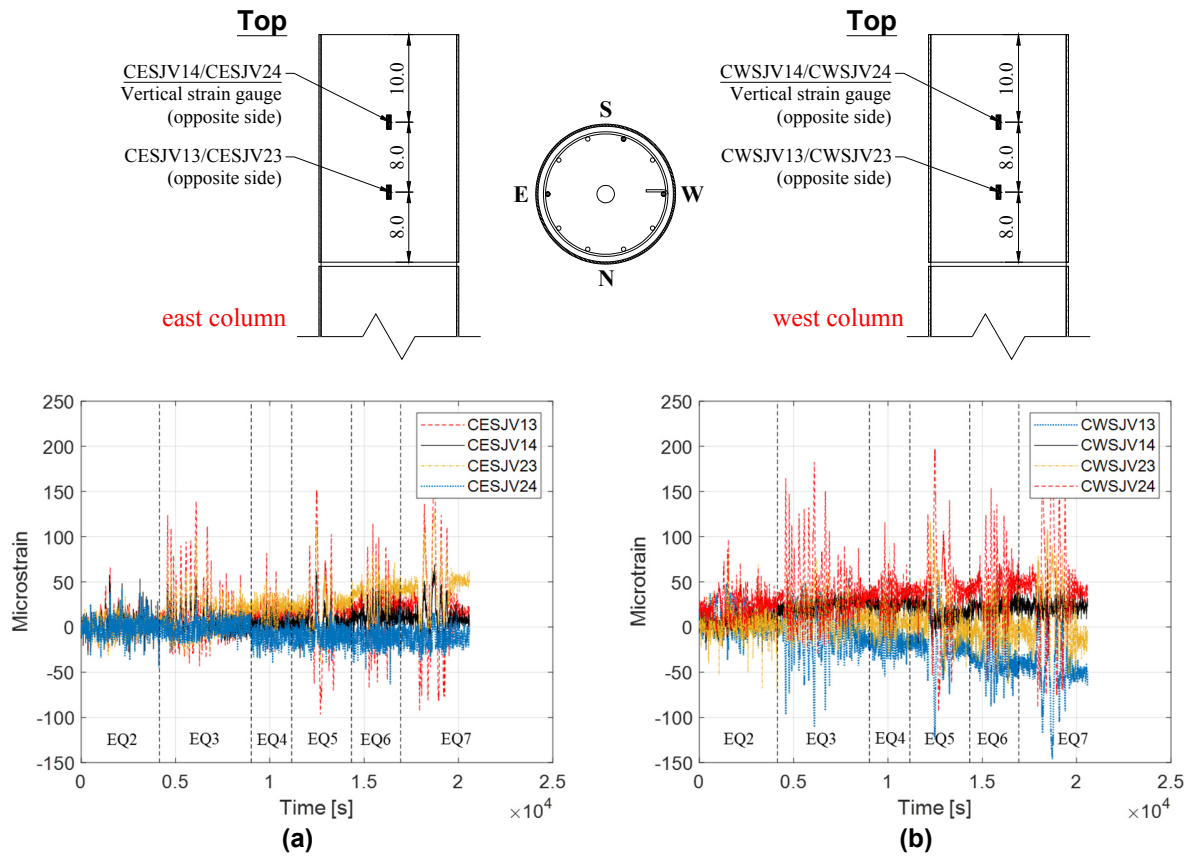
Vertical strains of the top embedded steel shell on (a) east column; and (b) west column.
